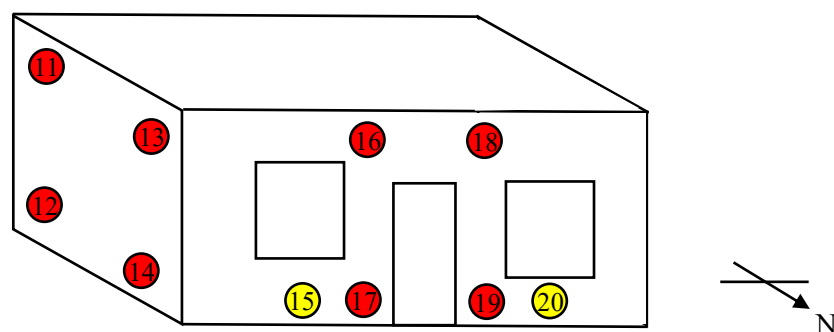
Monitoring locations inside the north facing walls and the east gable end wall.
